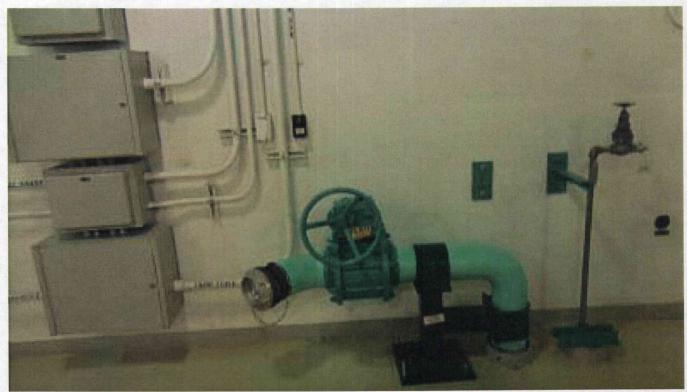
Continued: Auxiliary Building 620-foot elevation FLEX Photos: Page 2 of 38
